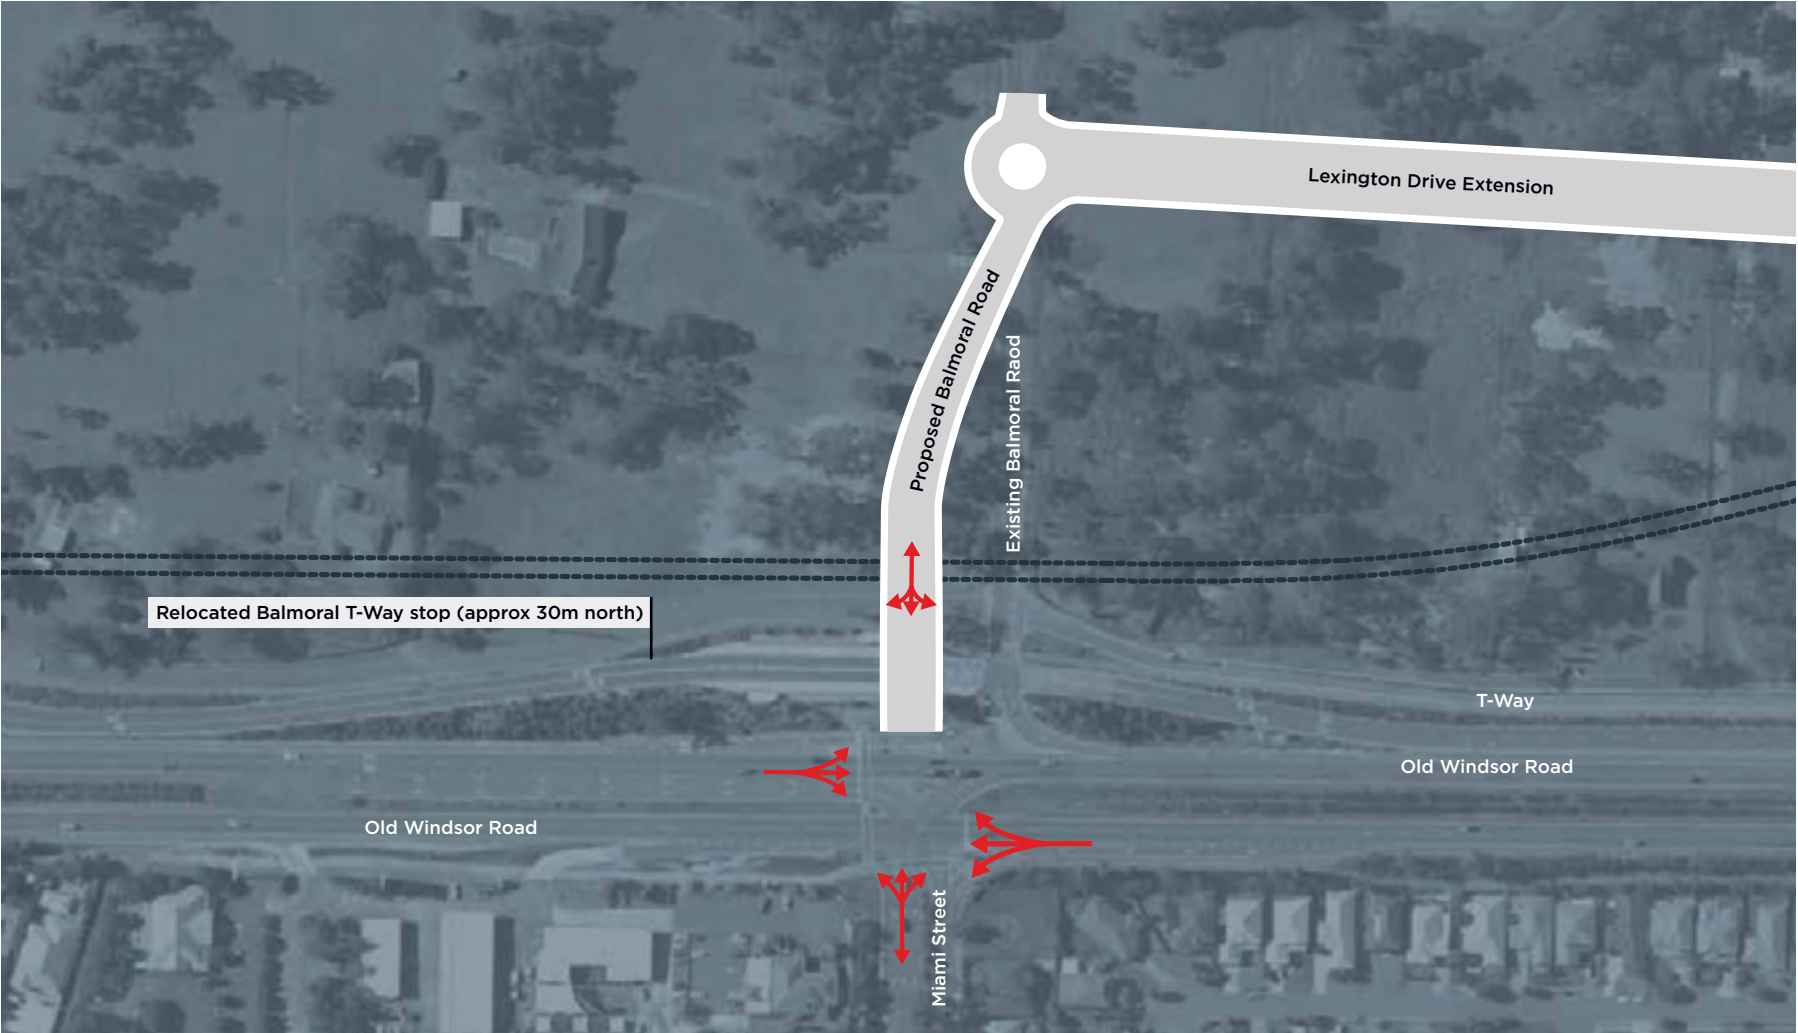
Bella Vista Station access from Glenwood with the proposed intersection arrangement
